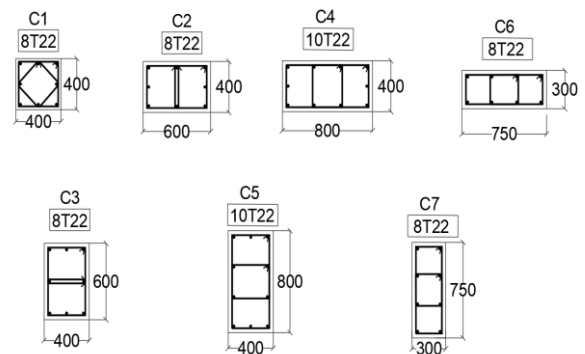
Details of columns' dimensions and reinforcement of all specimens
